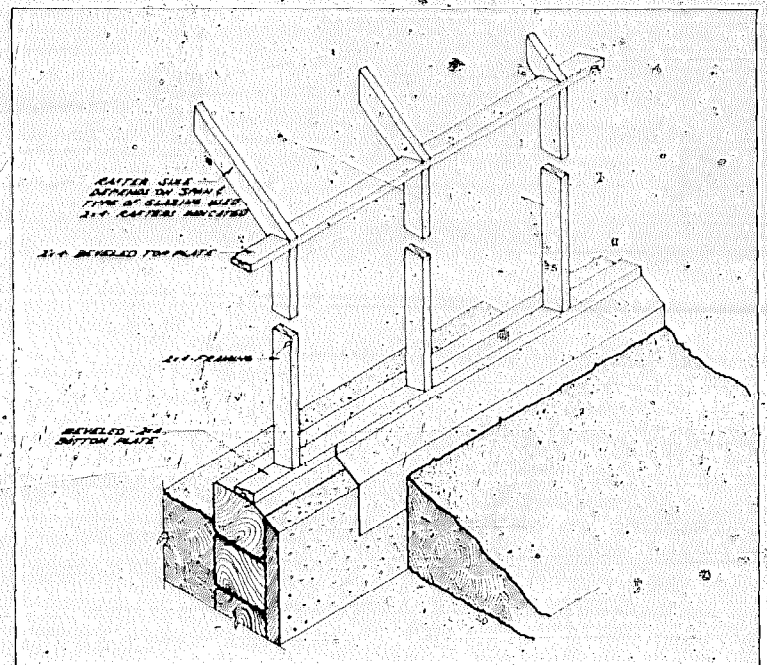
Structural kneewall shown with railroad tie foundation
